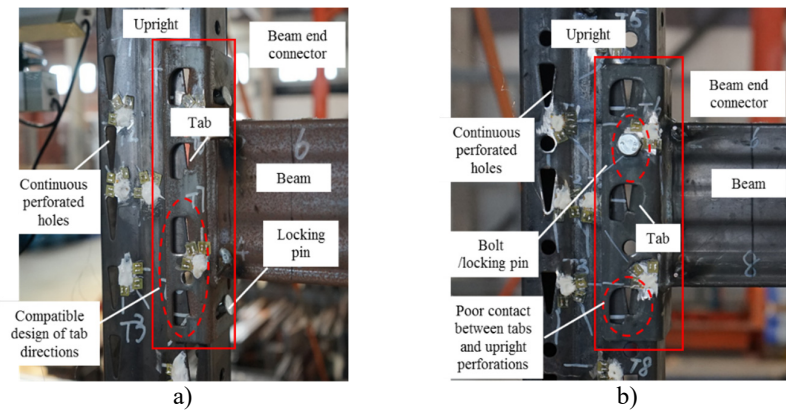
Typical configuration of beam-to-upright connections in storage racks. a) Boltless connection; b) Bolted connection
